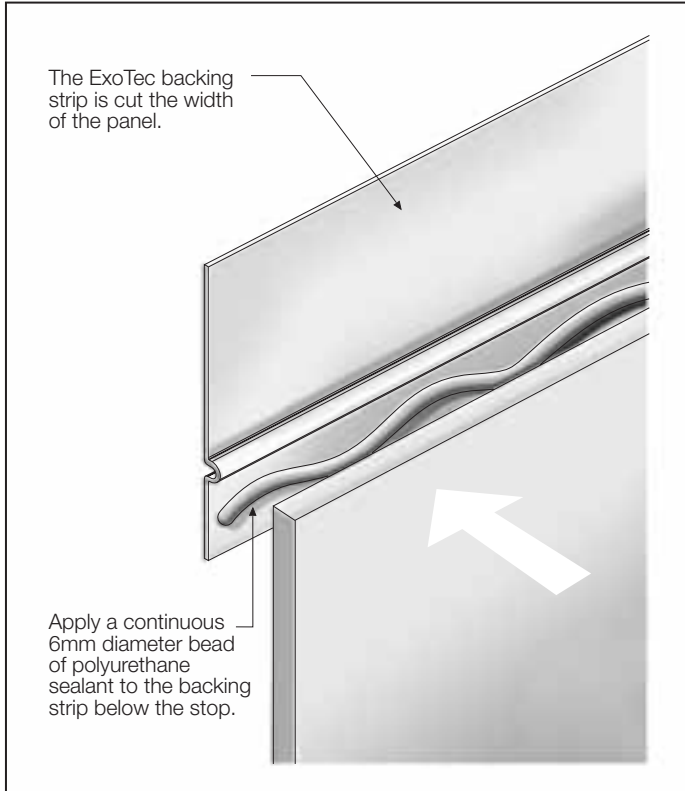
APPLYING SEALANT TO EXOTEC BACKING STRIP
